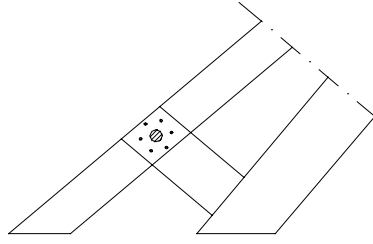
Connection in the hipping beam (the location of the detail is shown in Figure 6.9).
